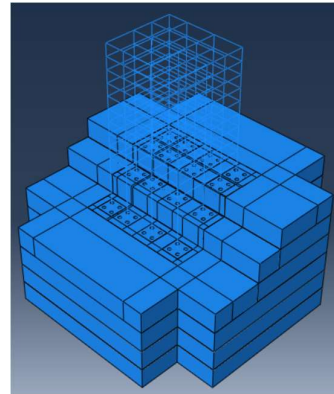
Isometric view of the model used for building without irregularity on sloping ground with pile foundation
